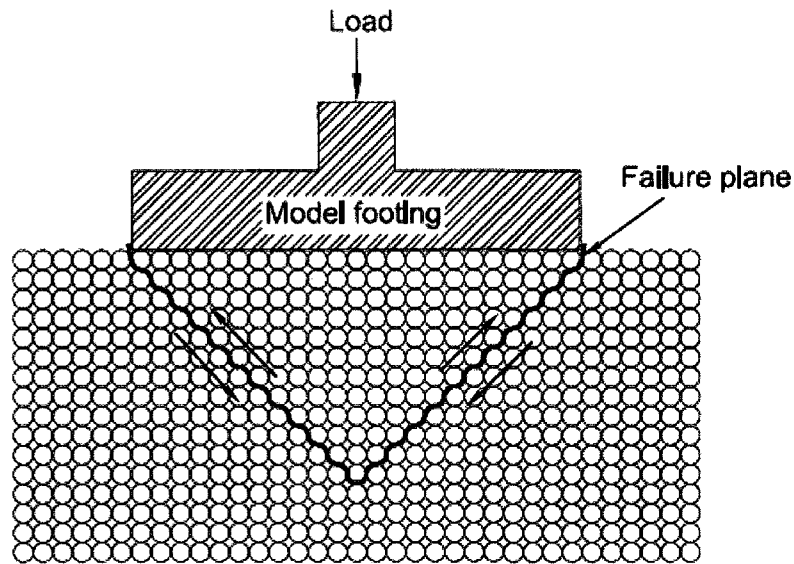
Well defined failure plane under model footing (Oh et al. 2009)
